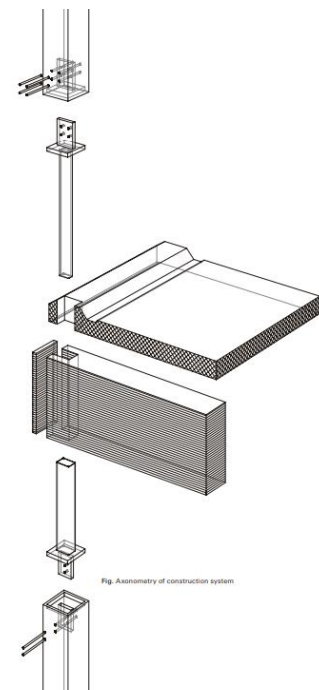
Connection beam and slab to column (*Development of Construction System for Multi-Storey Car Parks in BauBuche, n.d.*)
